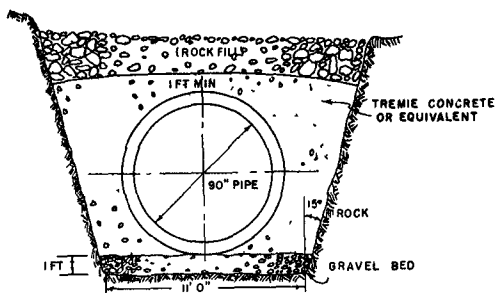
Surf section, rock trench anchorage Los Angeles County Sanitation Districts No. 3
